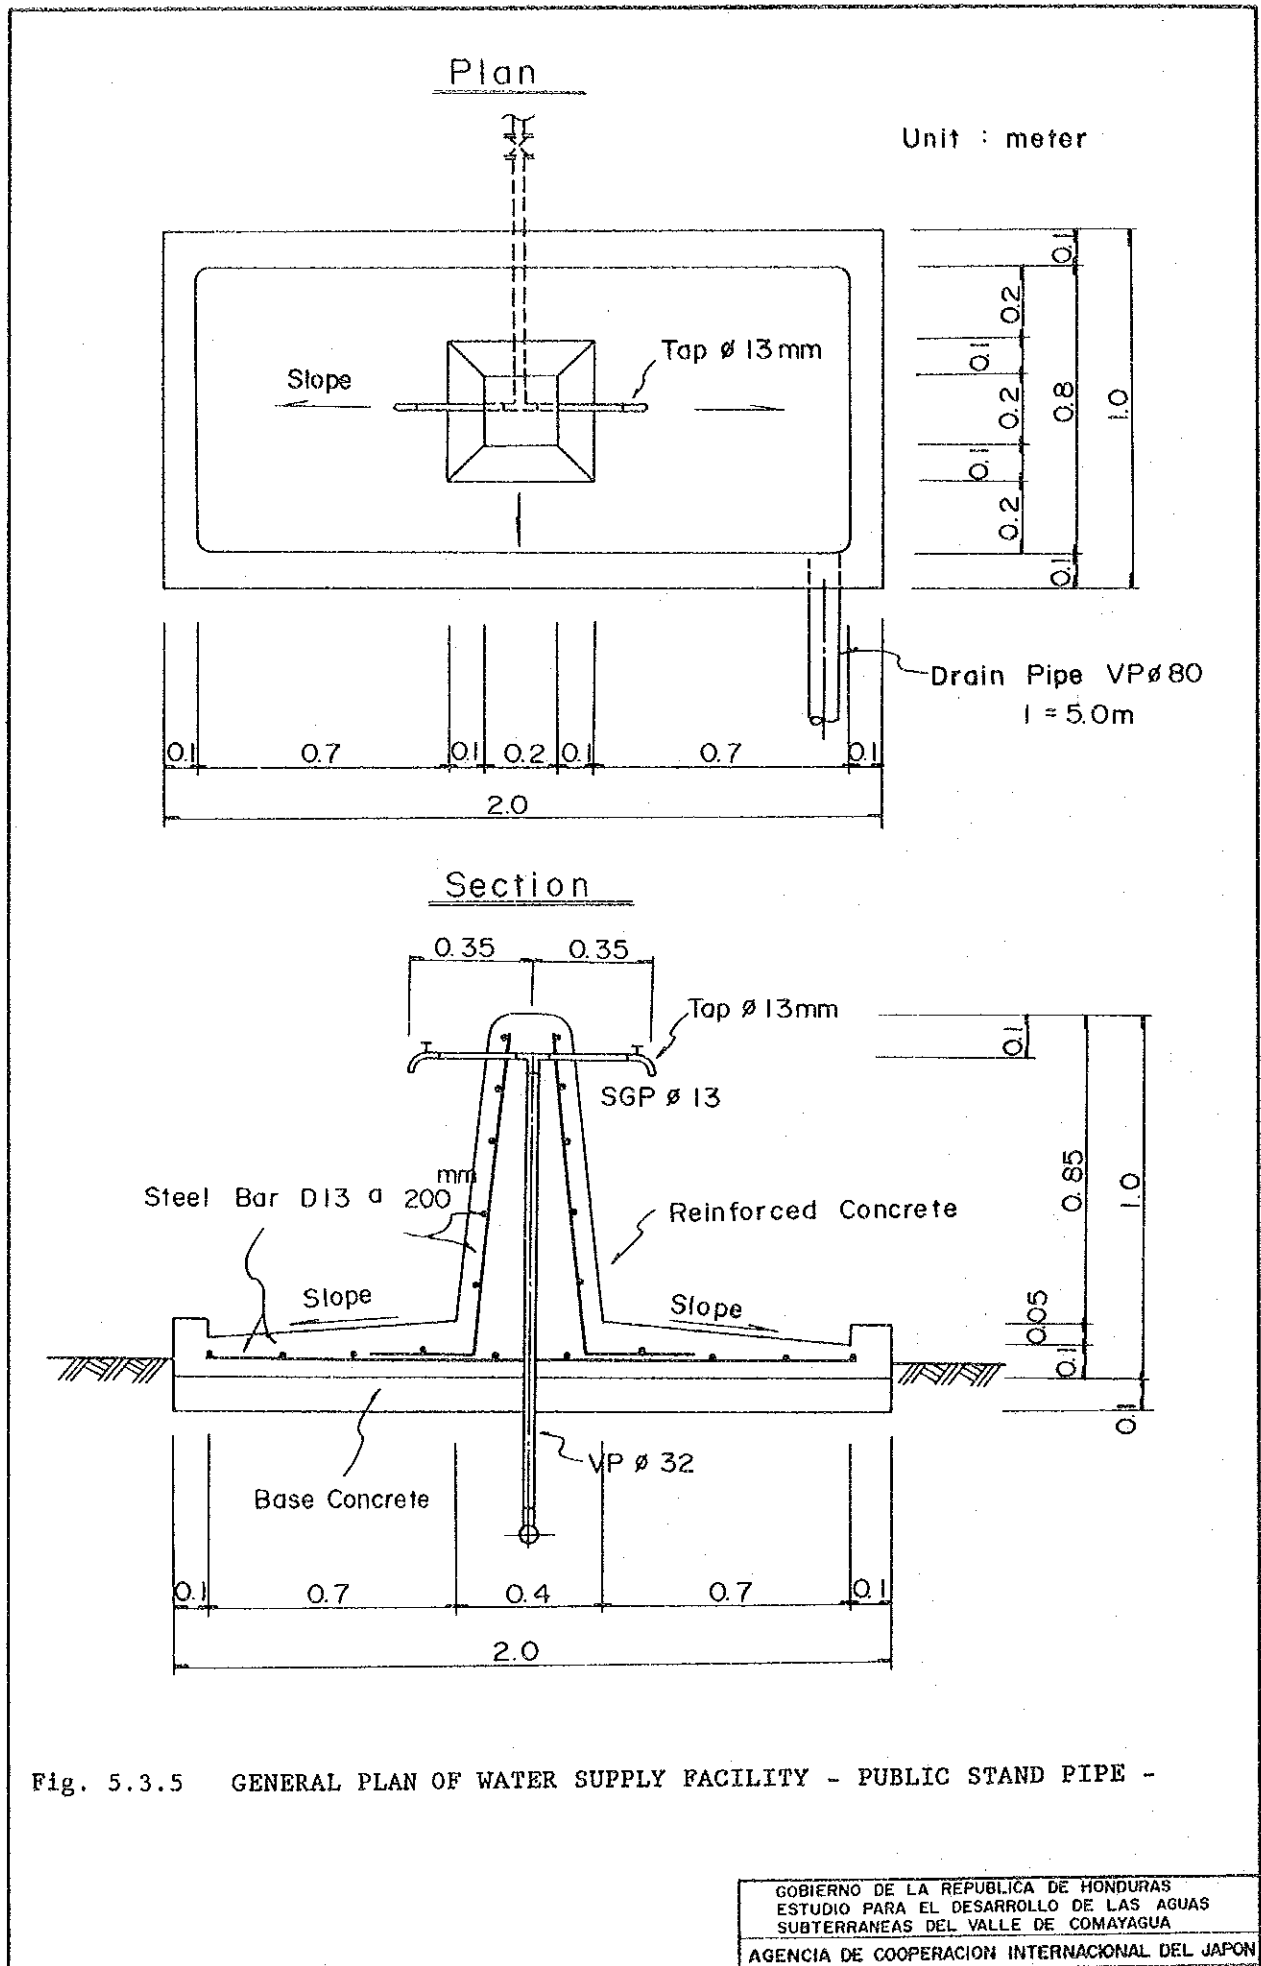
GENERAL PLAN OF WATER SUPPLY FACILITY - PUBLIC STAND PIPE -
